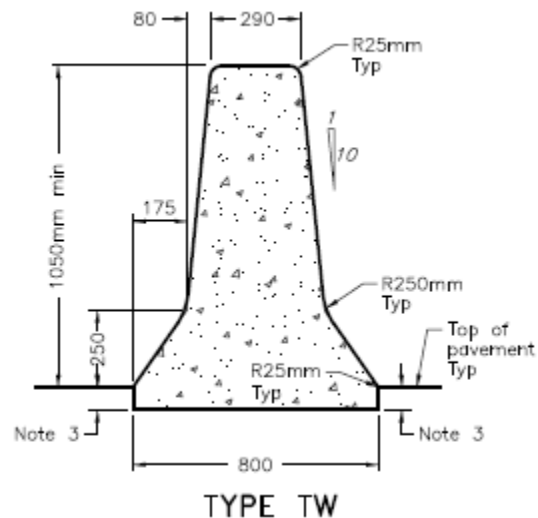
Details of Ontario Tall Wall Median Barrier
